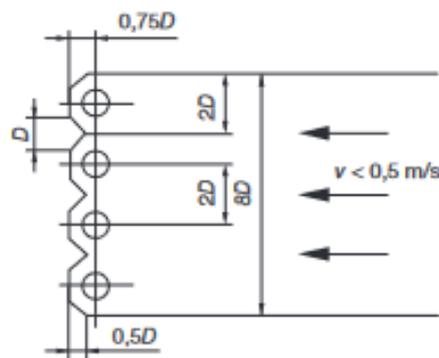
Pipe Spacing from Walls in Suction Lines.
